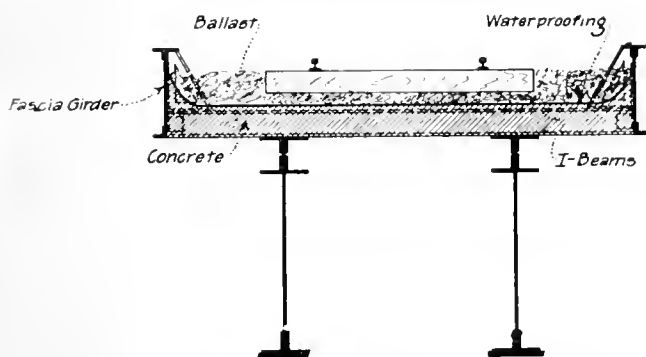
Cross Section Through Solid Floor I-Beam Construction.
